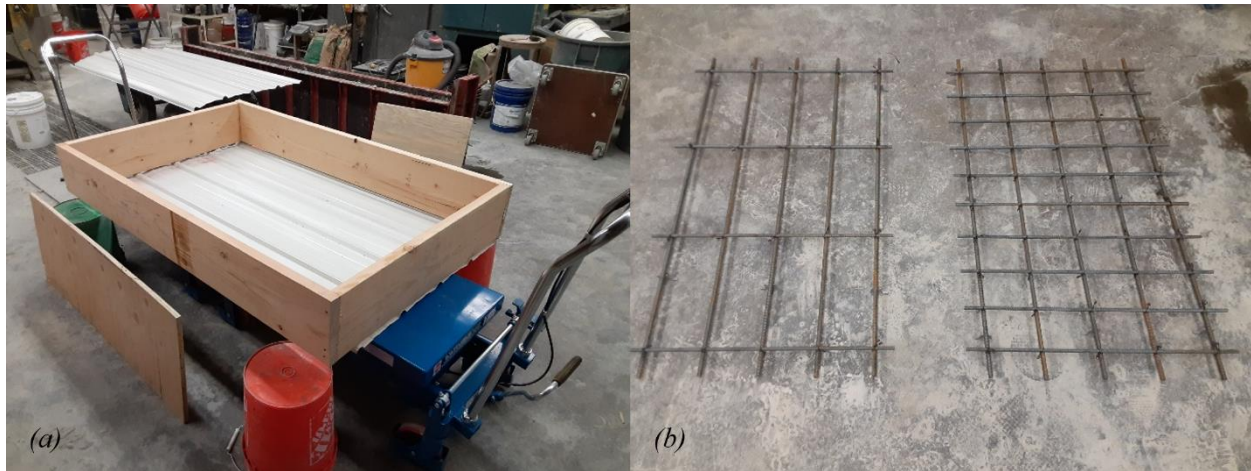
a) Bridge deck model form and b) finished reinforcement grids
